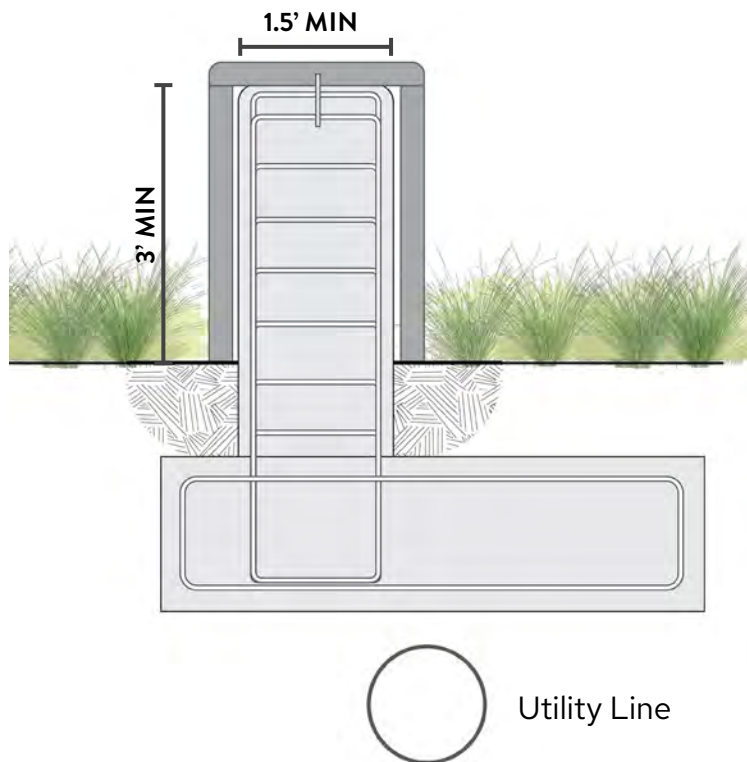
Anti-Ramming Rated Wall with Horizontal Foundation
